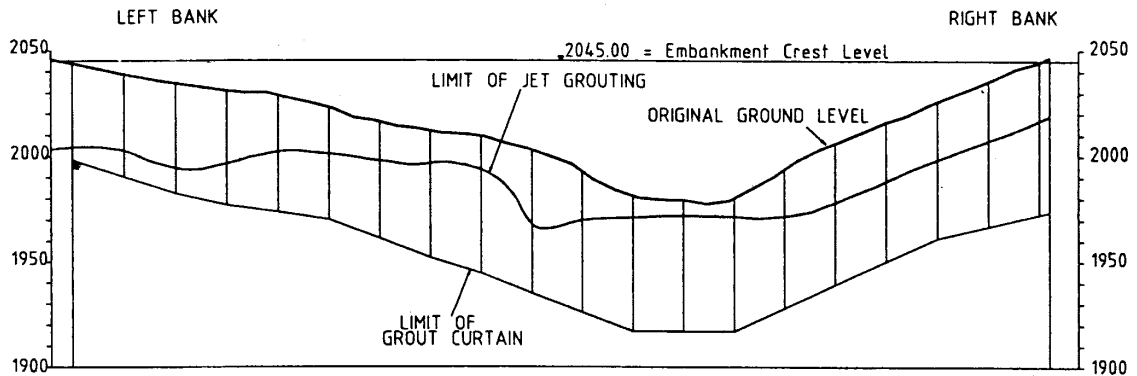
Longitudinal section of Thika dam showing limits of jet grout curtain and injection grout curtain
